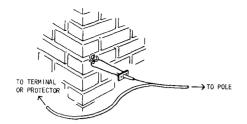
Multiple Drop Wire Installed at First Building Attachment
